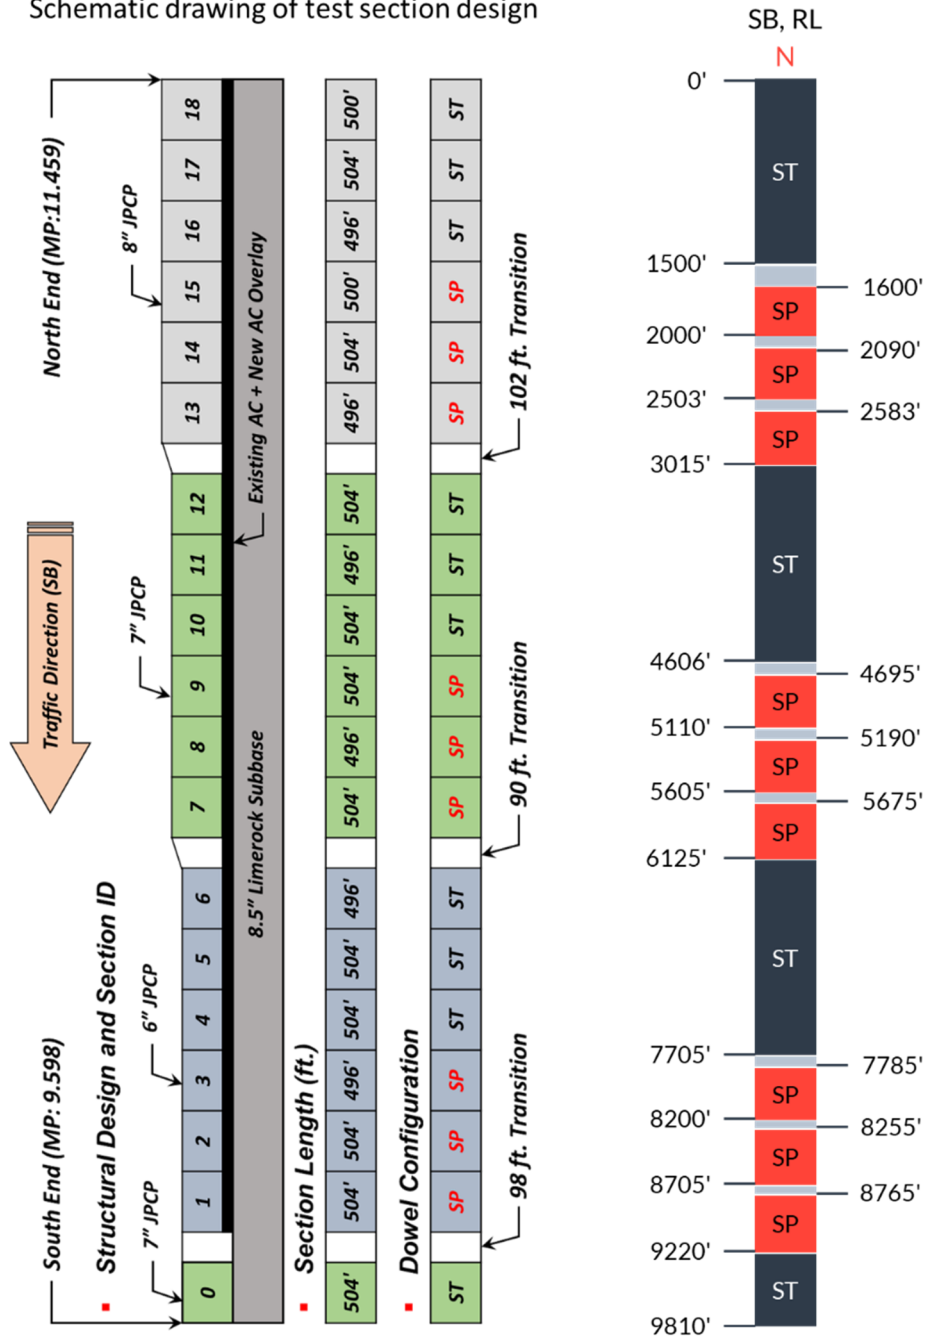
Schematic drawing of test section design dimensions provided by FDOT (left). Figures on the right represent the difference between the proposed and observed Test Section designs.
